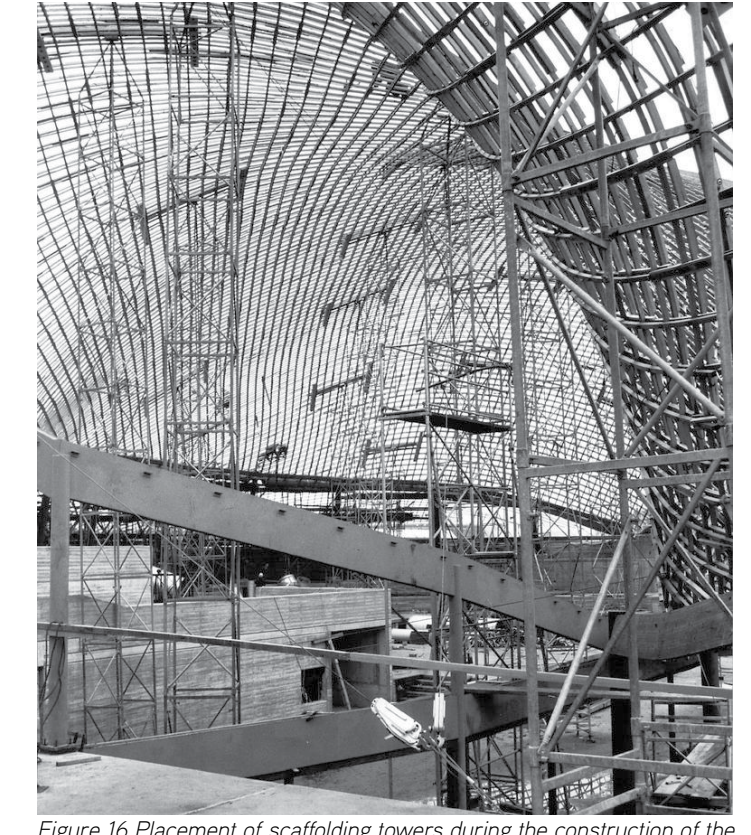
Placement of scaffolding towers during the construction of the Mannheim Multihalle. Source: Deutsche Bauzeitung (2015)
